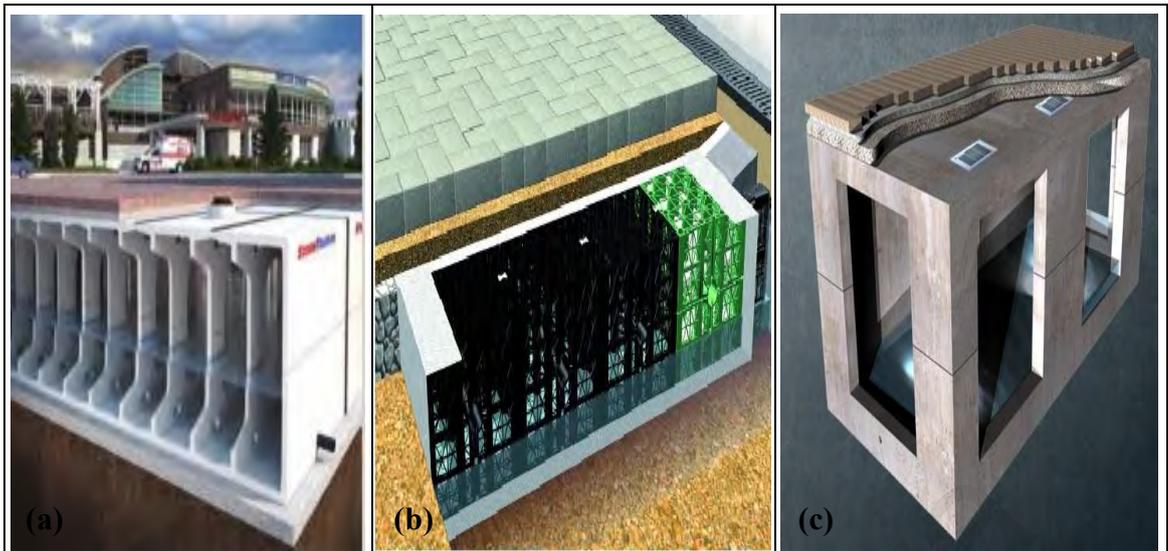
Commercial precast underground detention storage product constructed beneath permeable pavement (a) StormTrap, (b) Permavoid®, and (c) PermeCapture™.
